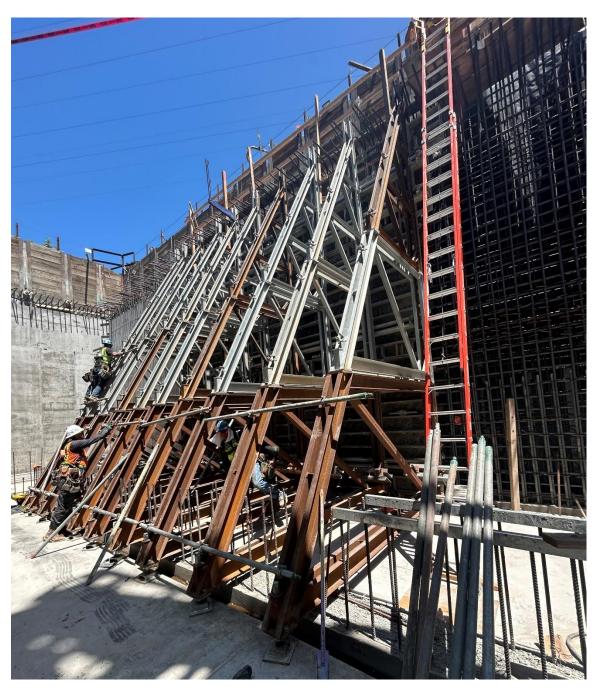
Carpenters setting steel bracing for support the 25-feet tall concrete wall forms from buckling under the extreme pressure of the concrete placed into them.
